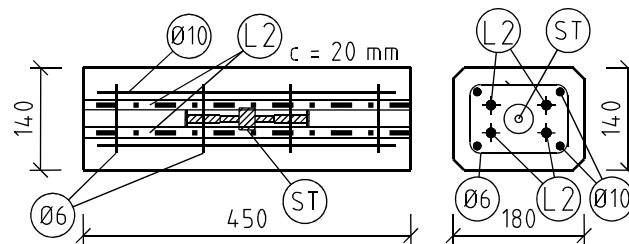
An experimental girder, cross section of girder and strain gauge installation
